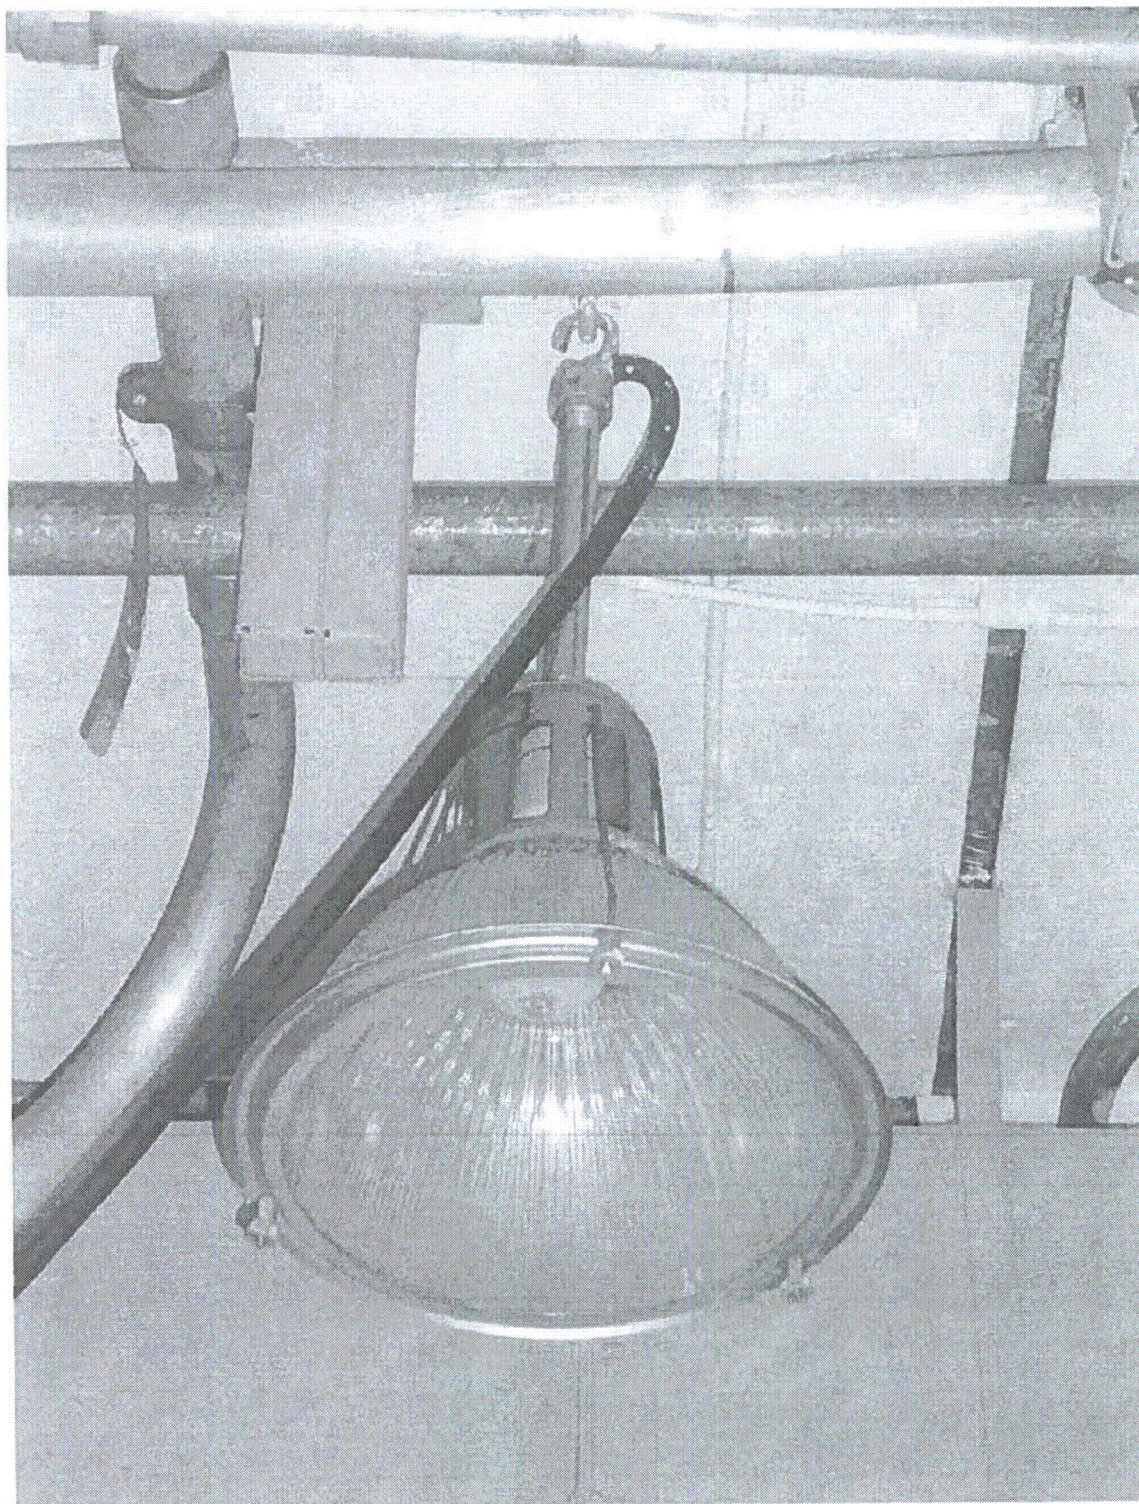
Hanging Rod with Open Hook (Room C-114)
